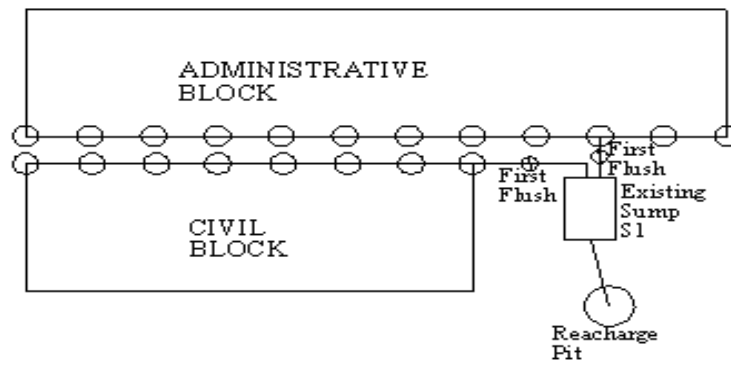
Schematic Plumbing Layout of Collection System for Sump S1
